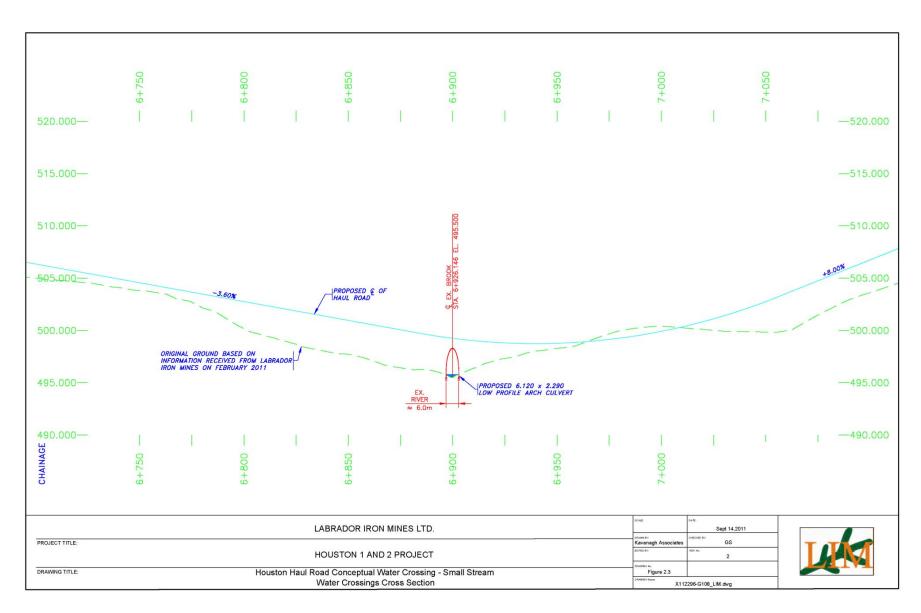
Houston Haul Road Conceptual Water Crossing -Small Stream Water Crossings Cross Section
